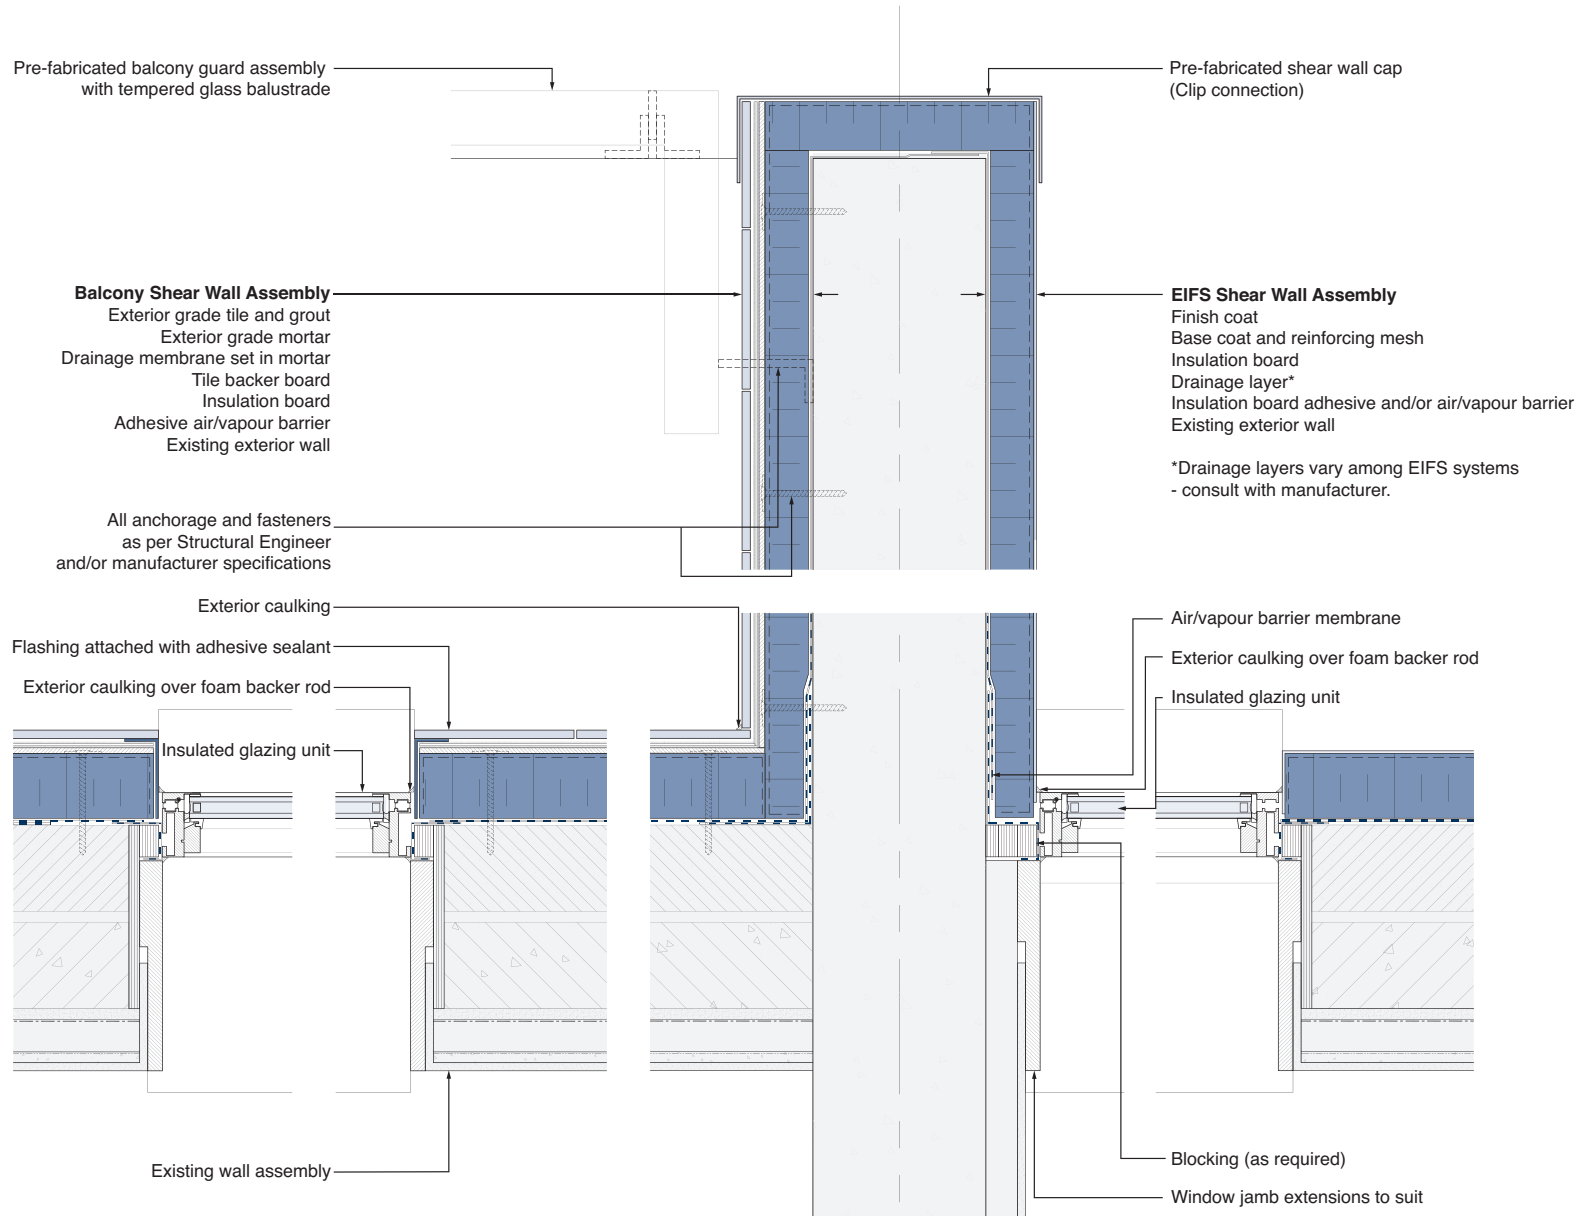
This plan detail depicts the transition from the tile cladding system to the EIFS overcladding. The shear wall end cap can be extended to serve as a chase for building services, and rendered in a variety of materials. Two replacement window conditions are depicted. The conventional punched window appears on the left, while the window that originally abutted the shear wall appears on the right. It requires additional blocking or an adjustable bracket to properly align and attach the window frame at this location. Foam sealant of the breaching to fill voids between the window and the rough opening is recommended, but not shown, to maintain the clarity of the drawing.
